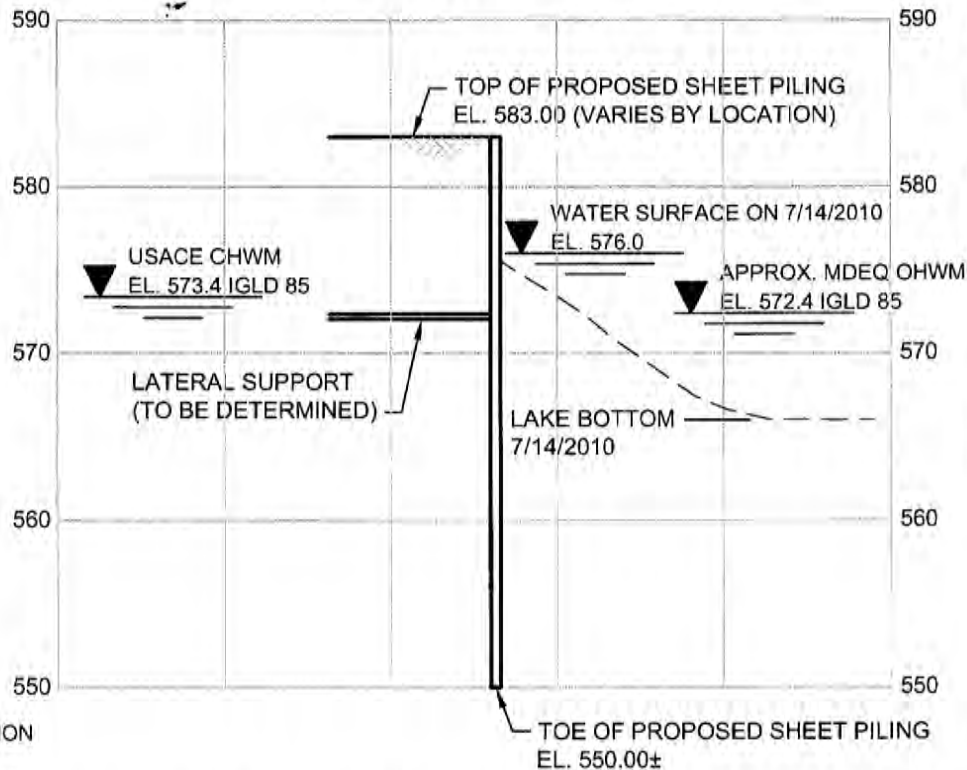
C LAKE ERIE CONSTRUCTION AREA PIPE DREDGING SECTION 'B' DETAILS
